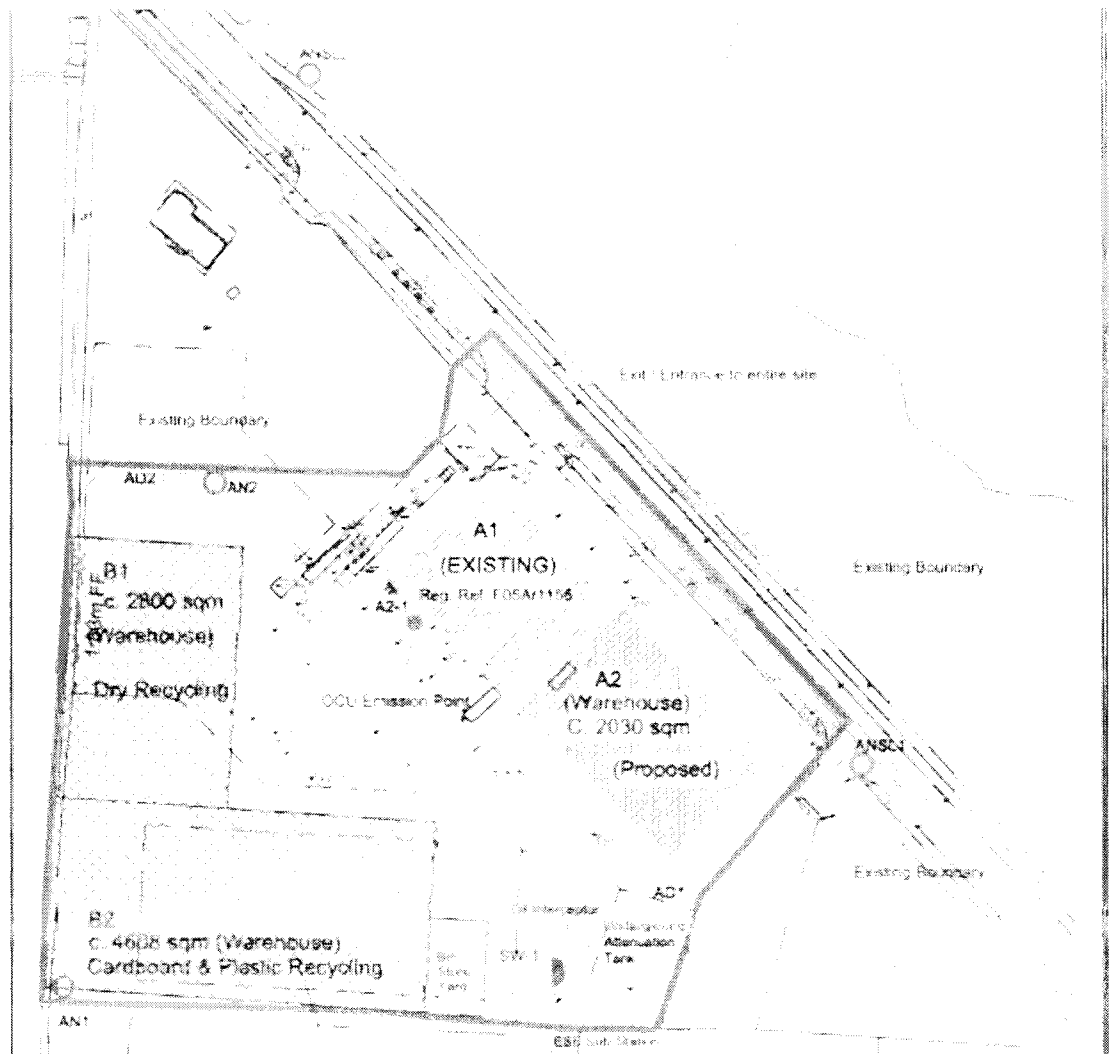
Proposed site layout for installation (ANSL1 and ANSL2 are noise sensitive locations).
